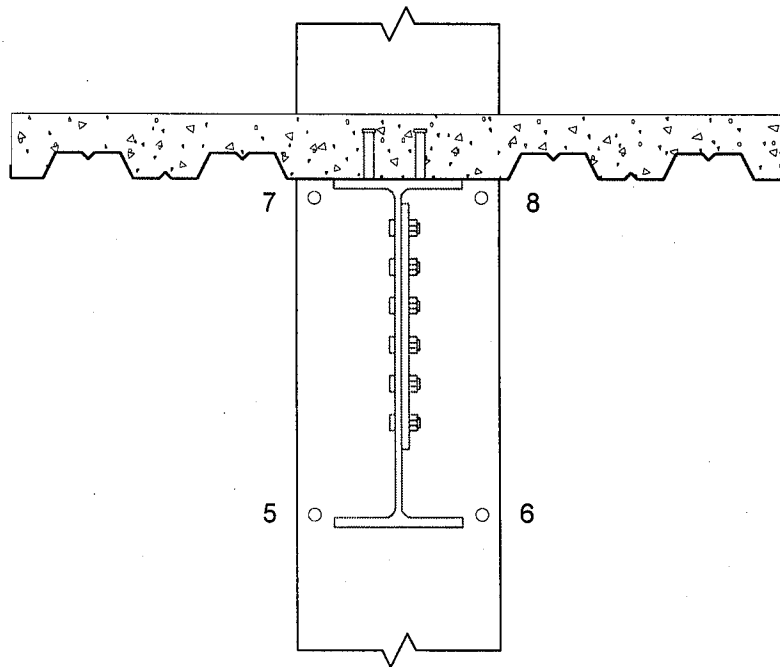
AE Transducer Locations (West Connection of Specimen 3)
